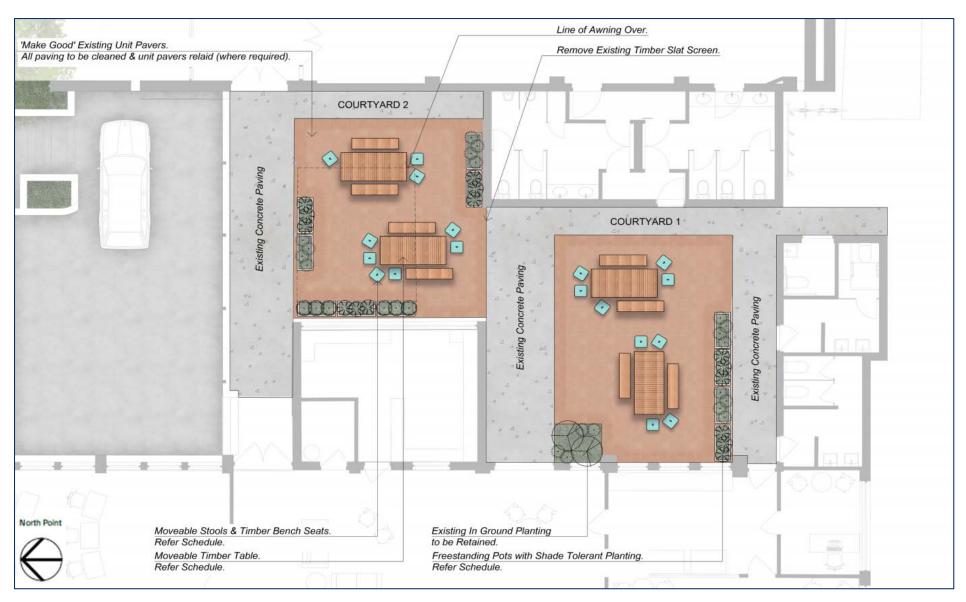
| Proposed courtyard landscaping (Source: Applicant's RtS)
